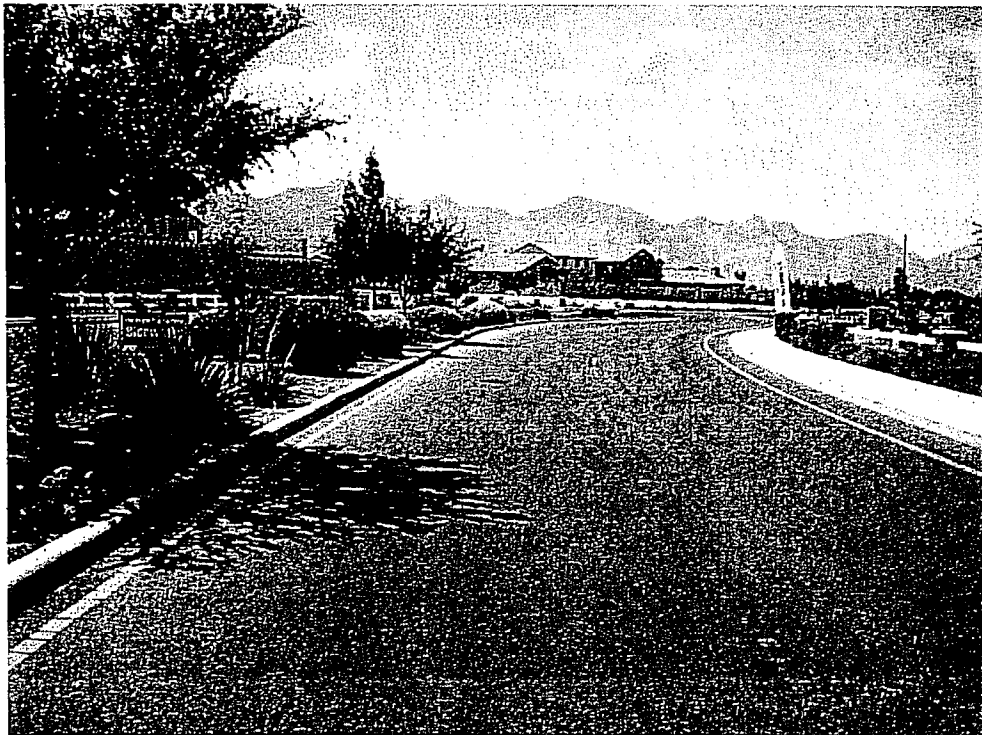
Street scene looking south on Eagle Crest Ranch Boulevard
